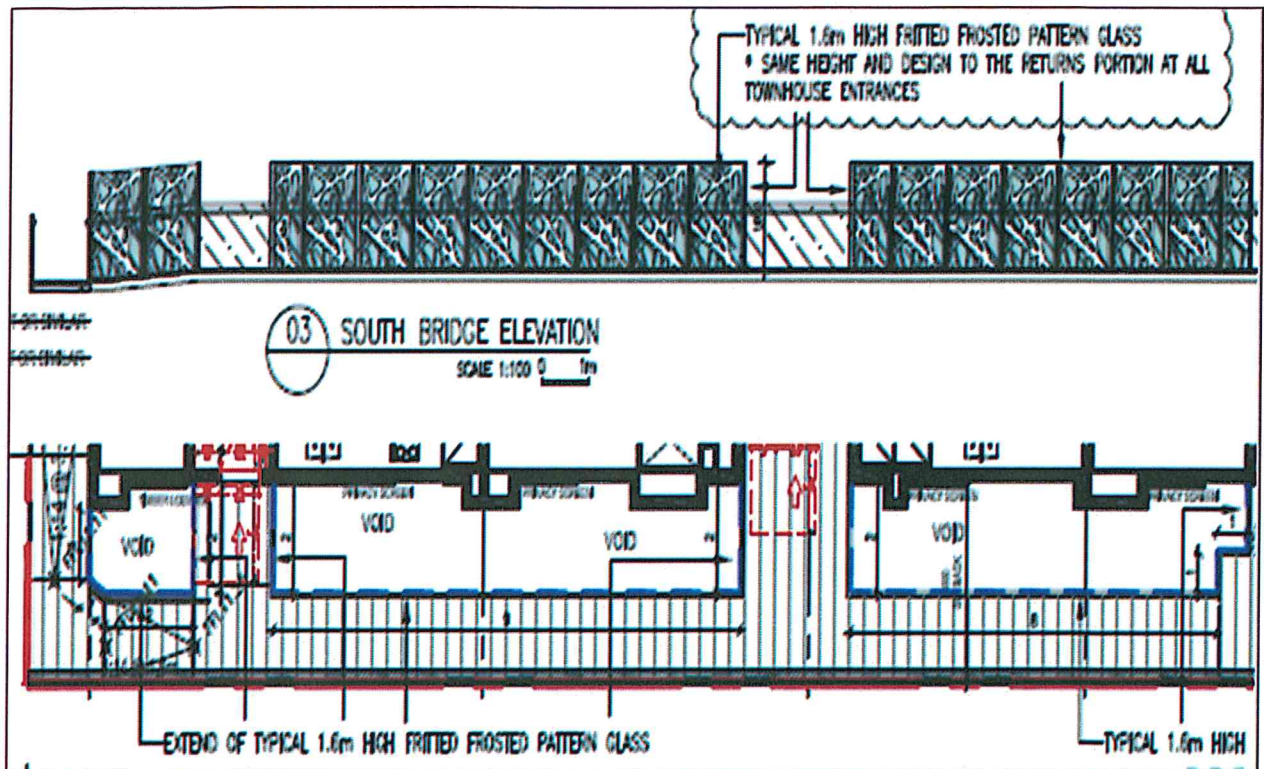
Part elevation of walkway screen (source: tony owen partners drawing A201 Rev C, dated 21.04.2015).
